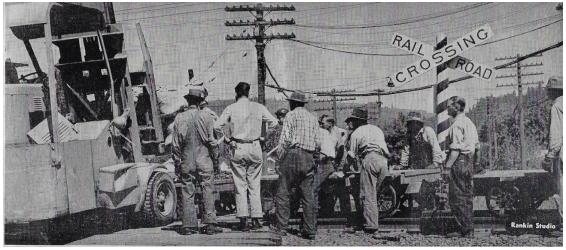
Where tracks ran near the dikes, sandbags were transferred to speeders and delivered by rail. (Rankin Studio photo) (Pictorial Revue)
